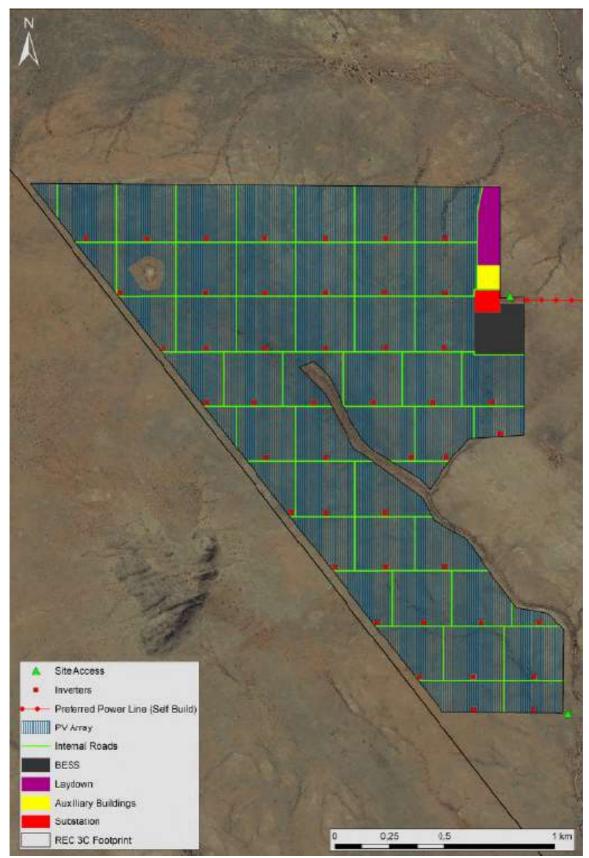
Proposed site layout plan for preferred development option (RE Capital 3C)
